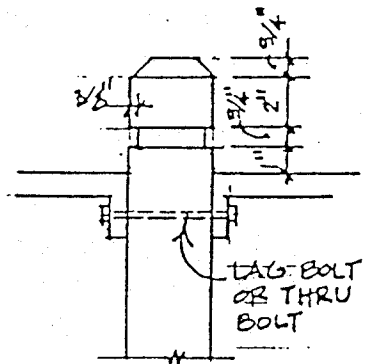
EXHIBIT "C" [REVISED EXHIBIT "F"]
